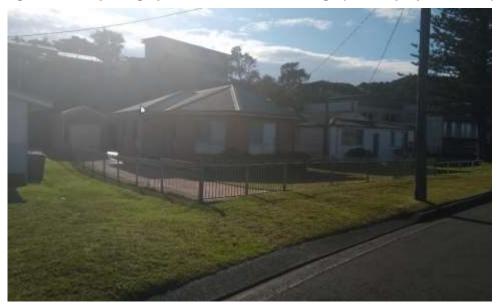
Site photograph – Burke Street frontage (view of proposed Lot 1)
